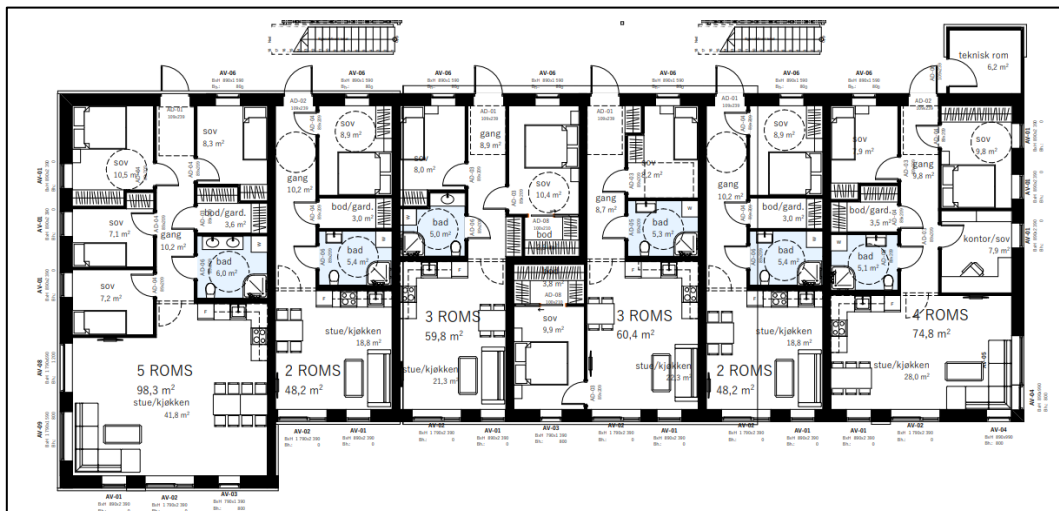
Floor plan (Odin Prosjektering AS, 2021b)
